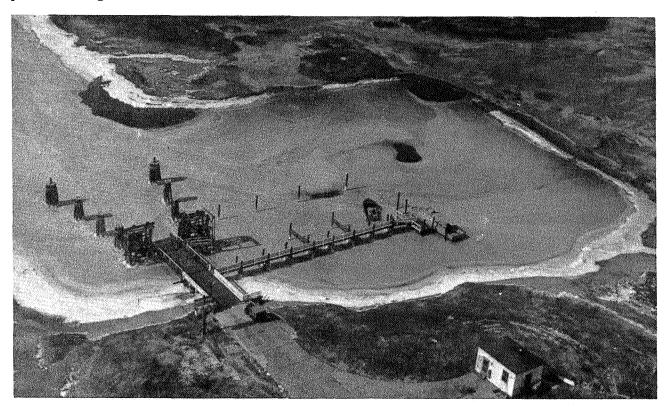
Aerial view of Wallops Island Dock, showing ferry landing, pier for small boats, and turning basin added in 1957.
